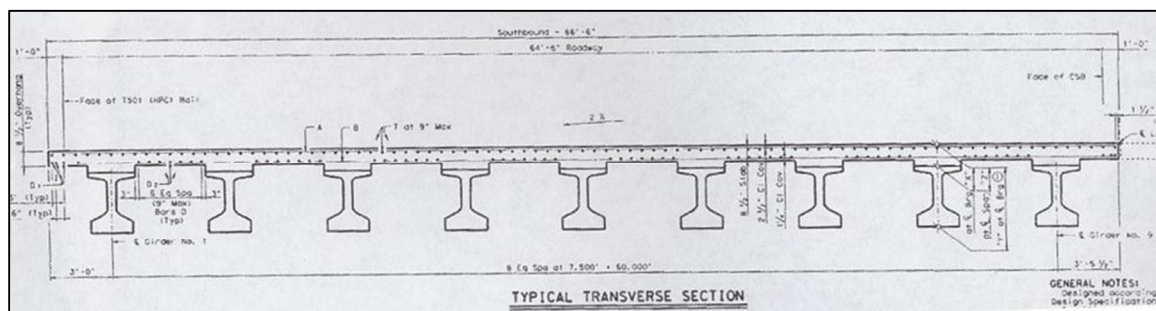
Cross section of Lubbock bridge deck southbound lane.
